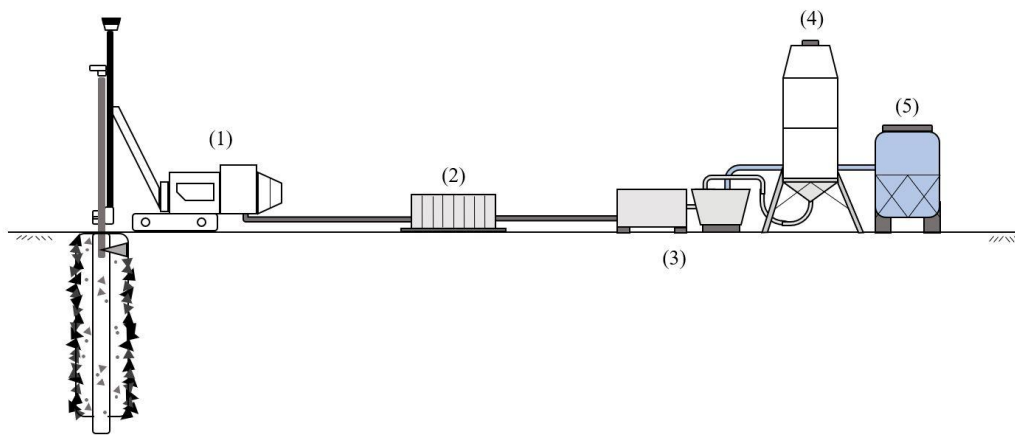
The basic set-up of jet grouting equipment including (1) jet rig, (2) pump, (3) mixing plant with dosage, (4) cement storage, and (5) water tank (adapted from Croce et al., 2014).
